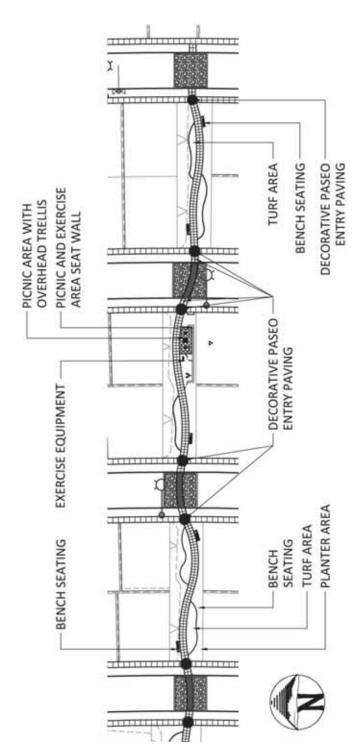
Private Open Space (POS-1) - Village Paseo East Segment
